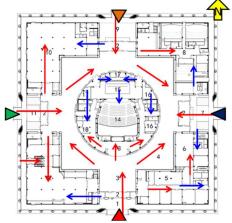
The Ground Floor – source: www.archdaily.com+ student work
